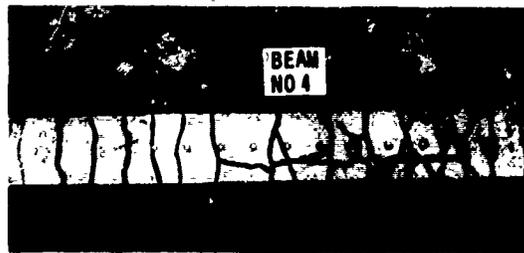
Crack pattern in beam 4 at various load levels (sheet 1 of 2)
